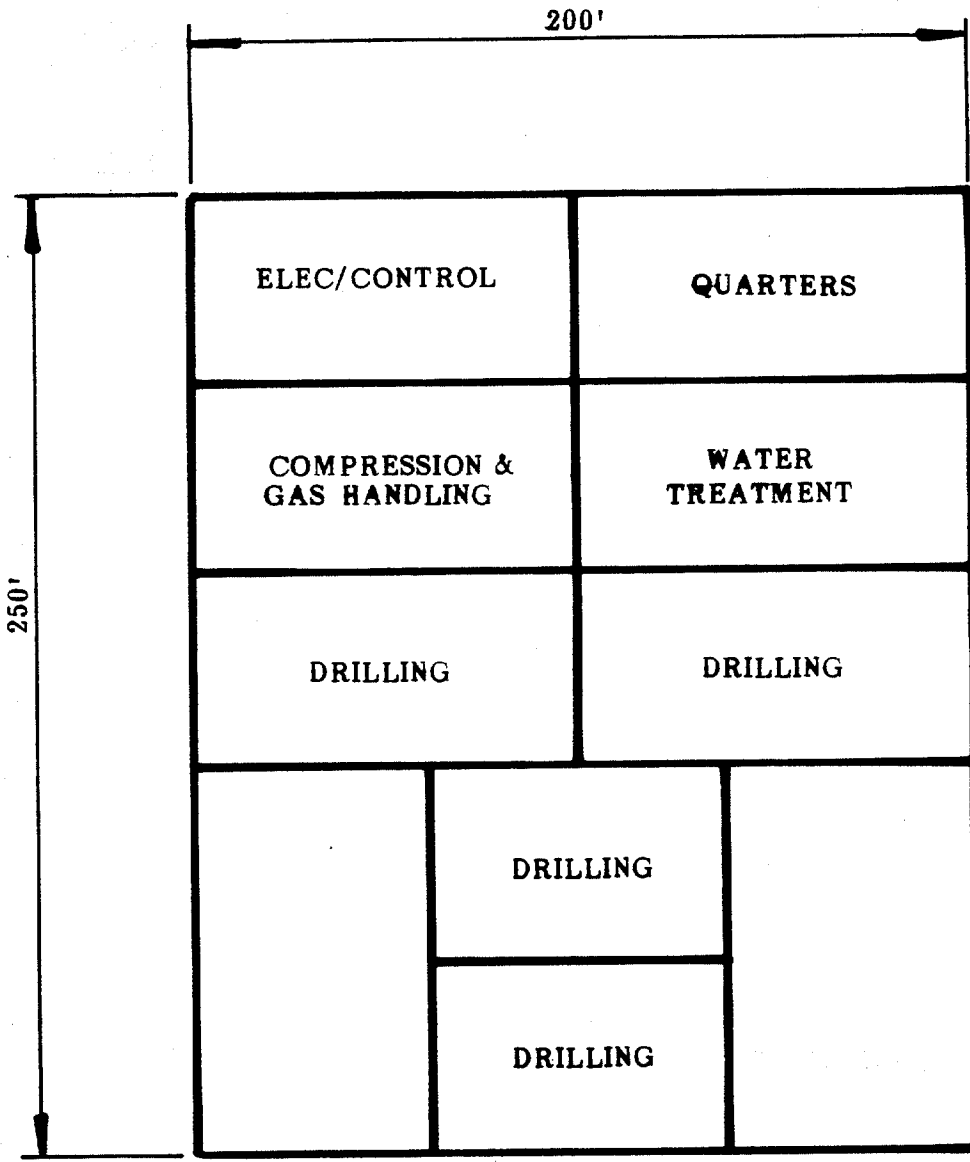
LEVEL 2 DECK LAYOUT
